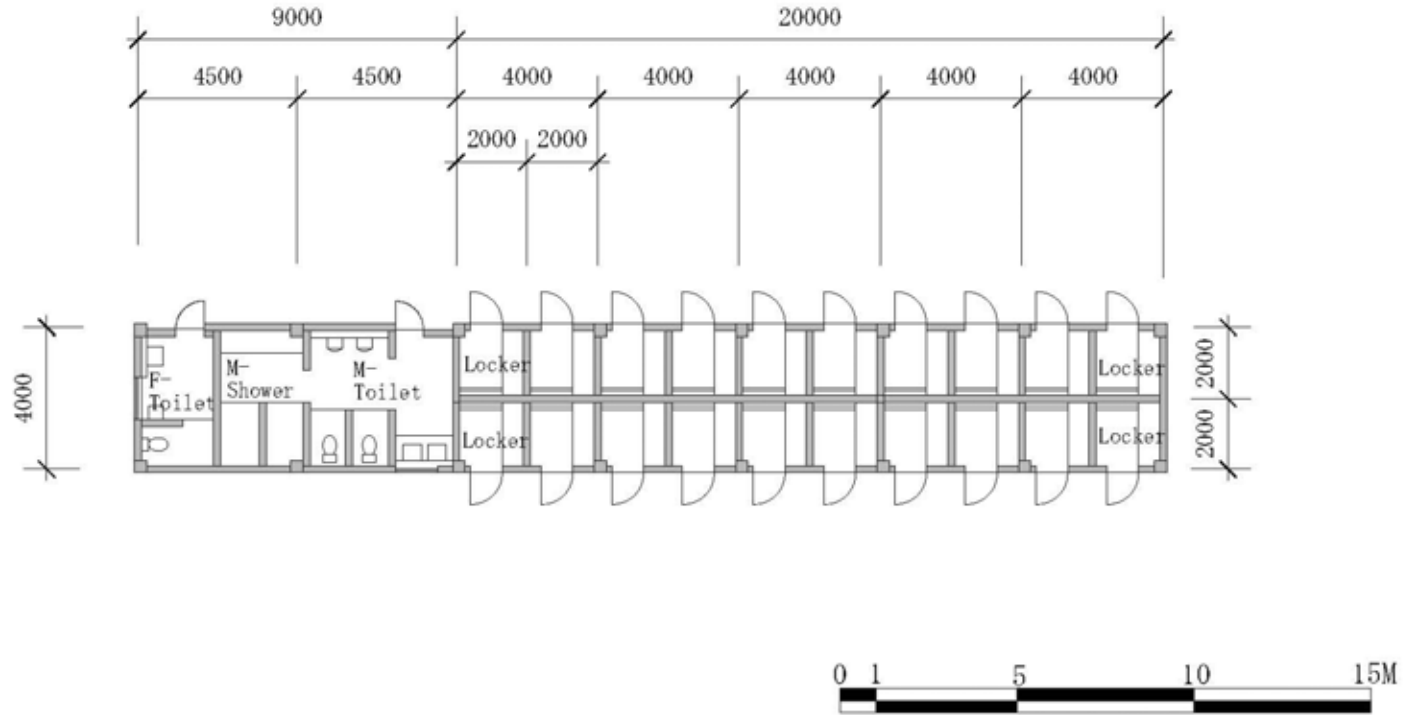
(15) Floor Plan for the Fishermen's Locker Building
